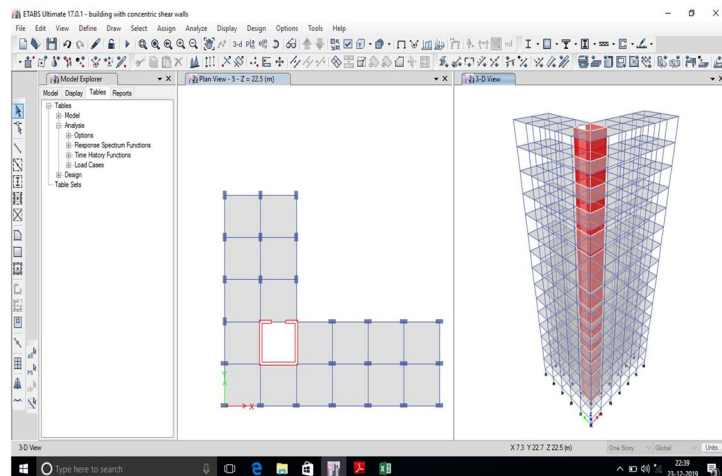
Case 5- Plan and 3-D view of building (ETAB MODEL)
